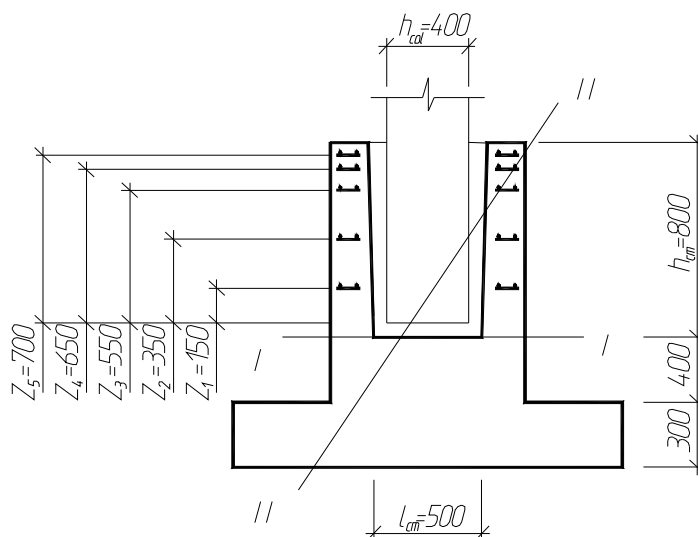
To calculations of a subcolumn on an inclined section.
